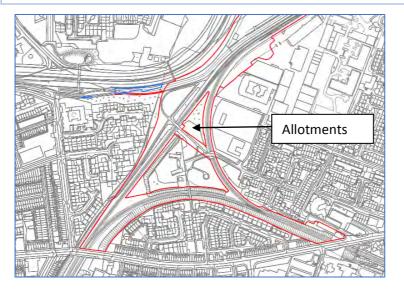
Extract from Site Location Plan illustrating location of existing allotments
